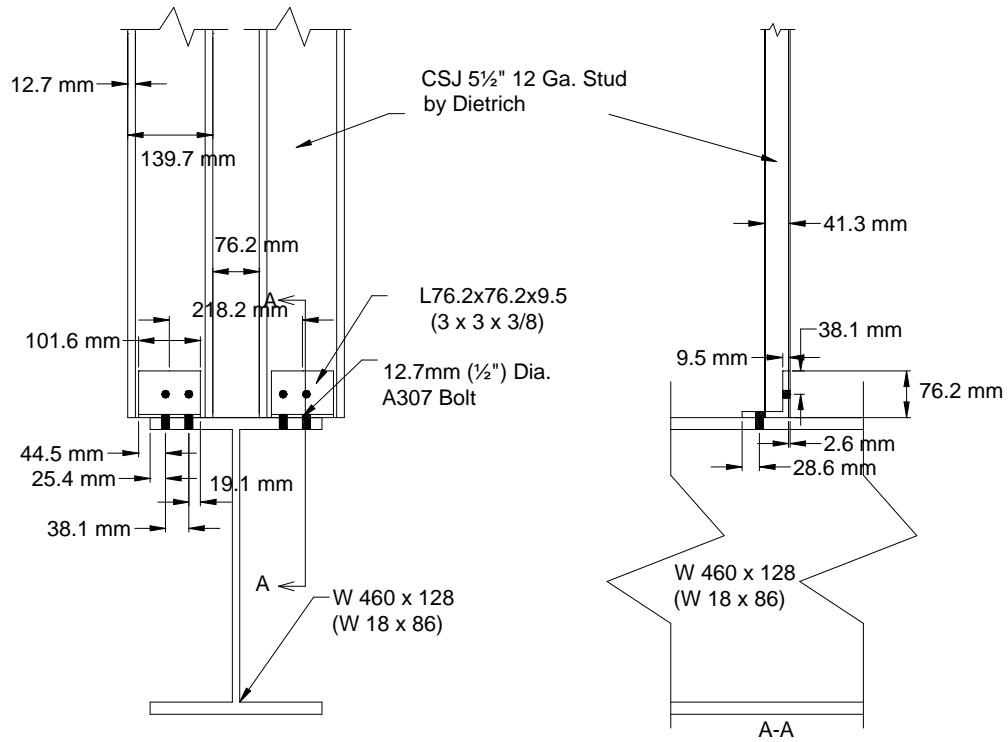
Cold-Formed Steel Stud-to-Beam Connection Details for Specimen F1
